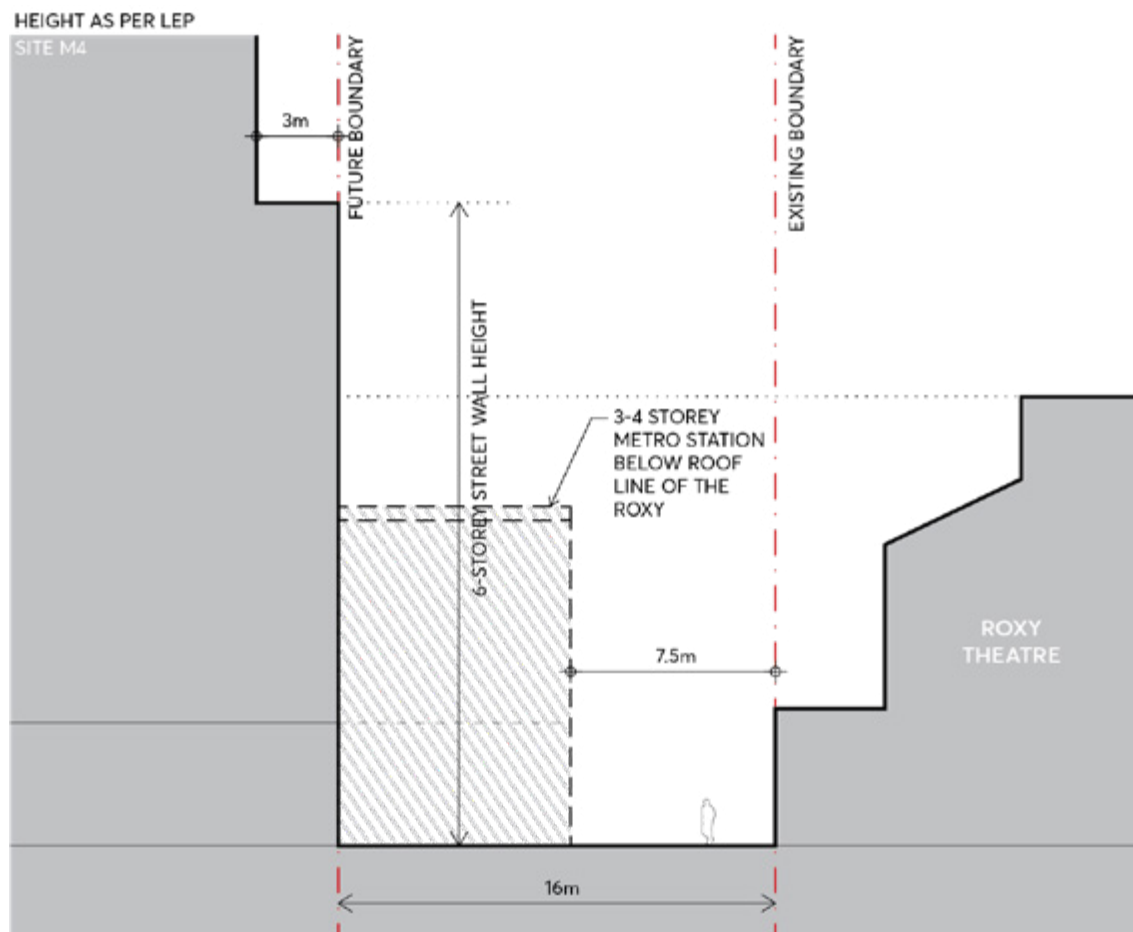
Macquarie Lane (Section E) Setbacks & Street Wall Height
